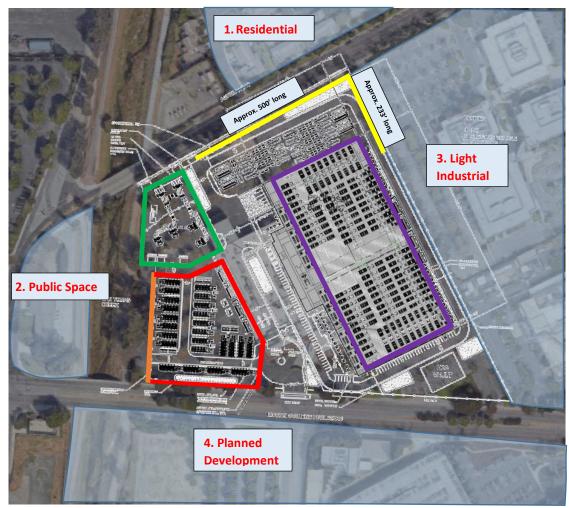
Project site plan showing outdoor mechanical equipment, nearest neighbours, and acoustic barriers color coded
